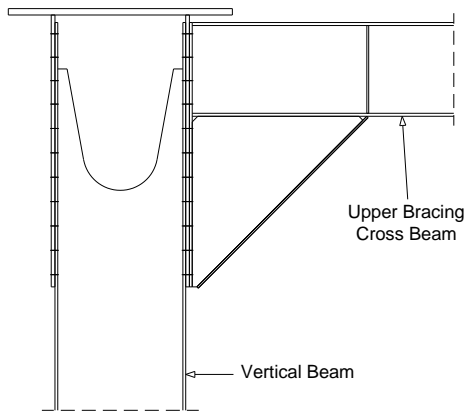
Side view of upper bracing cross beams with variable end cross sections
